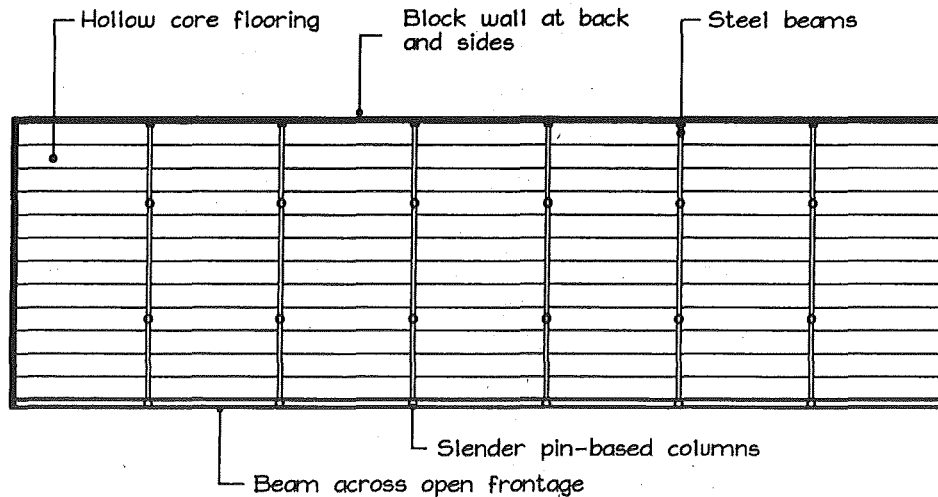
Illustrative layout plan of the Northridge car park building
